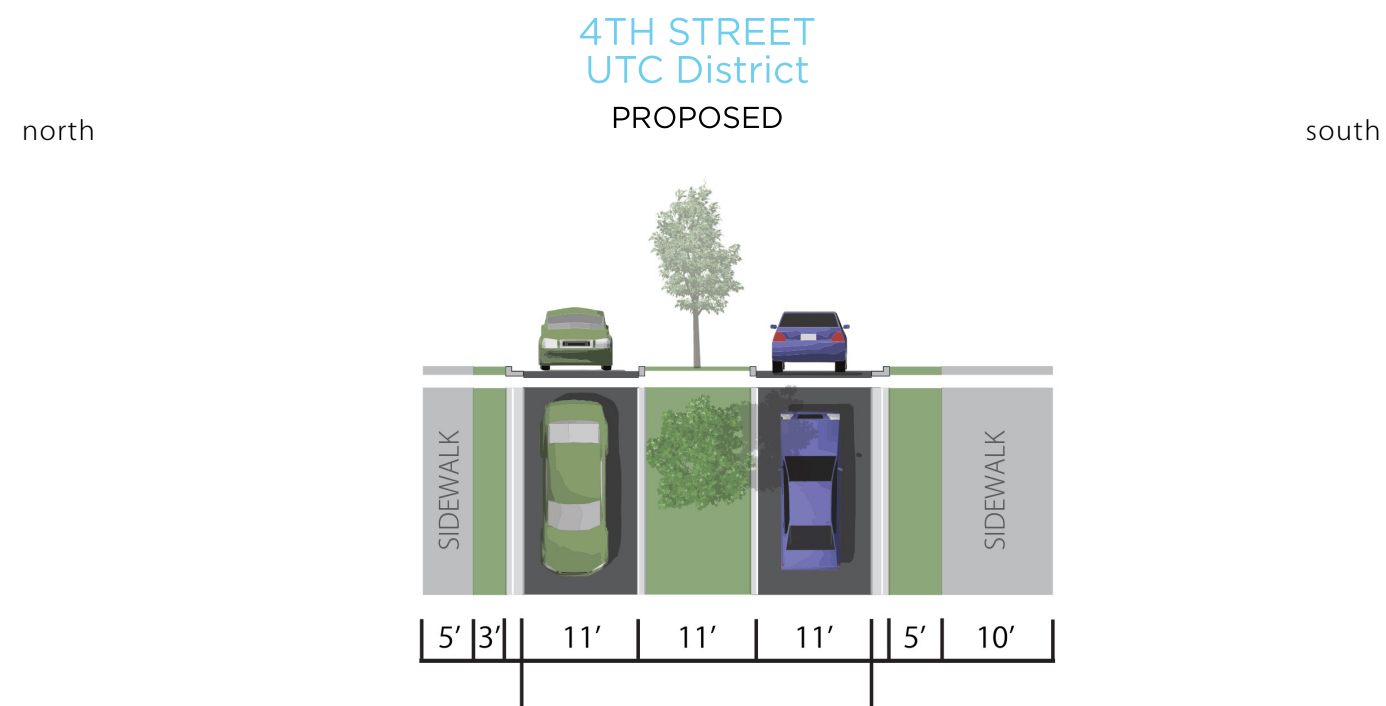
4th Street Cross-Section | UTC, Proposed—Option A
